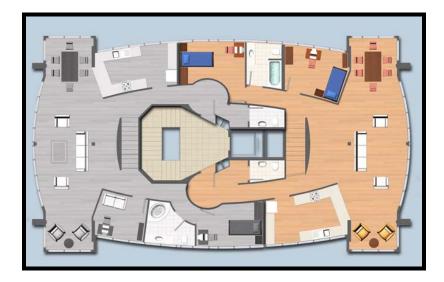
Upper Floor Plan of the Ground Floor Duplex Apartment in Nautilus Residence 78
